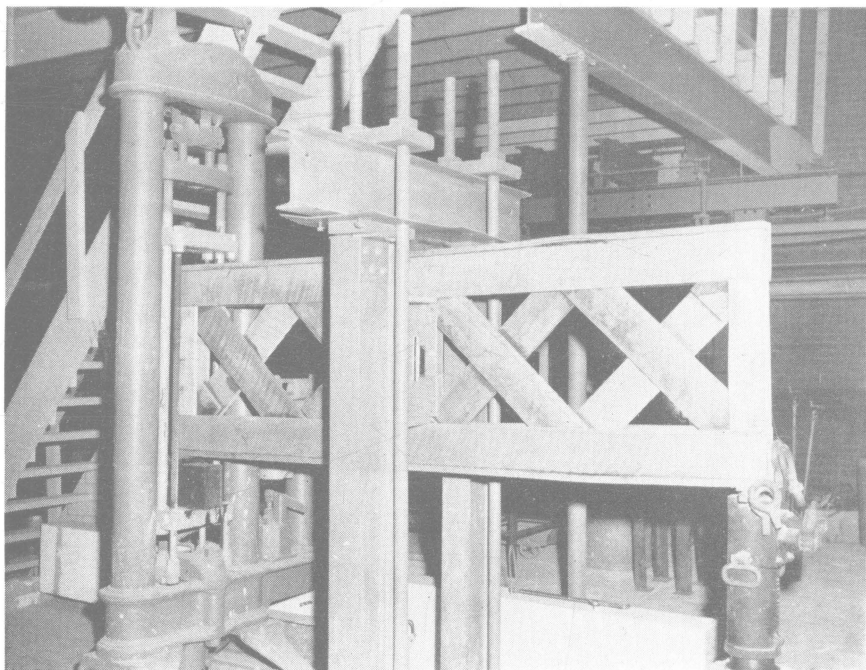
Lattice Truss being tested to failure of web members in shear in hydraulic testing machine. Note the separation of the cap from the flange at the midpoint between load and support.
